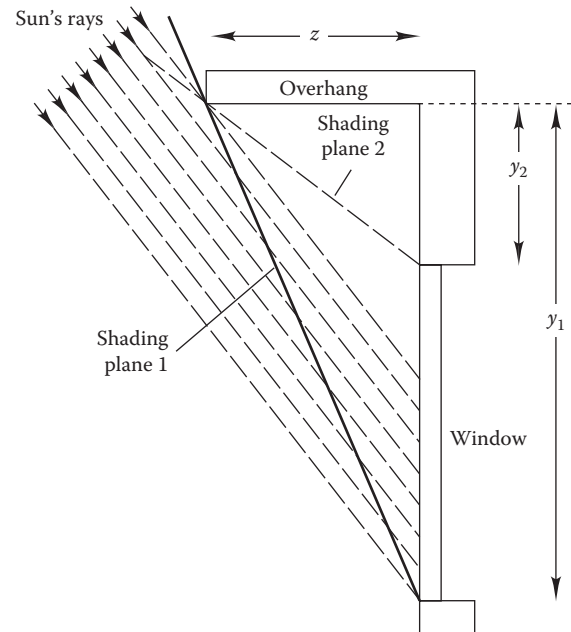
Shading of a south-facing window from a horizontal overhang.
